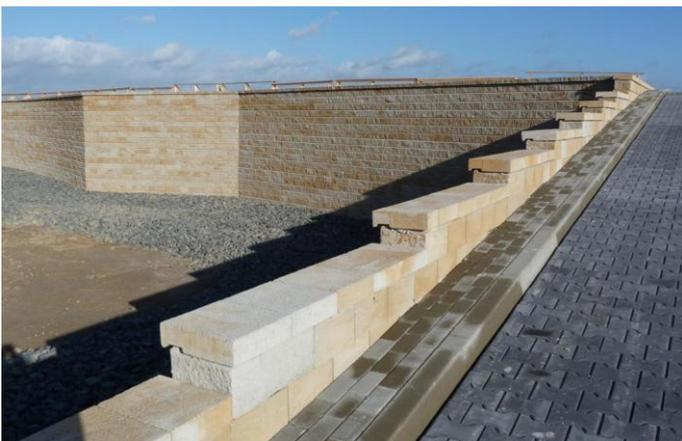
Stone block wall with slip ramp shortly after completion of the relevant work
